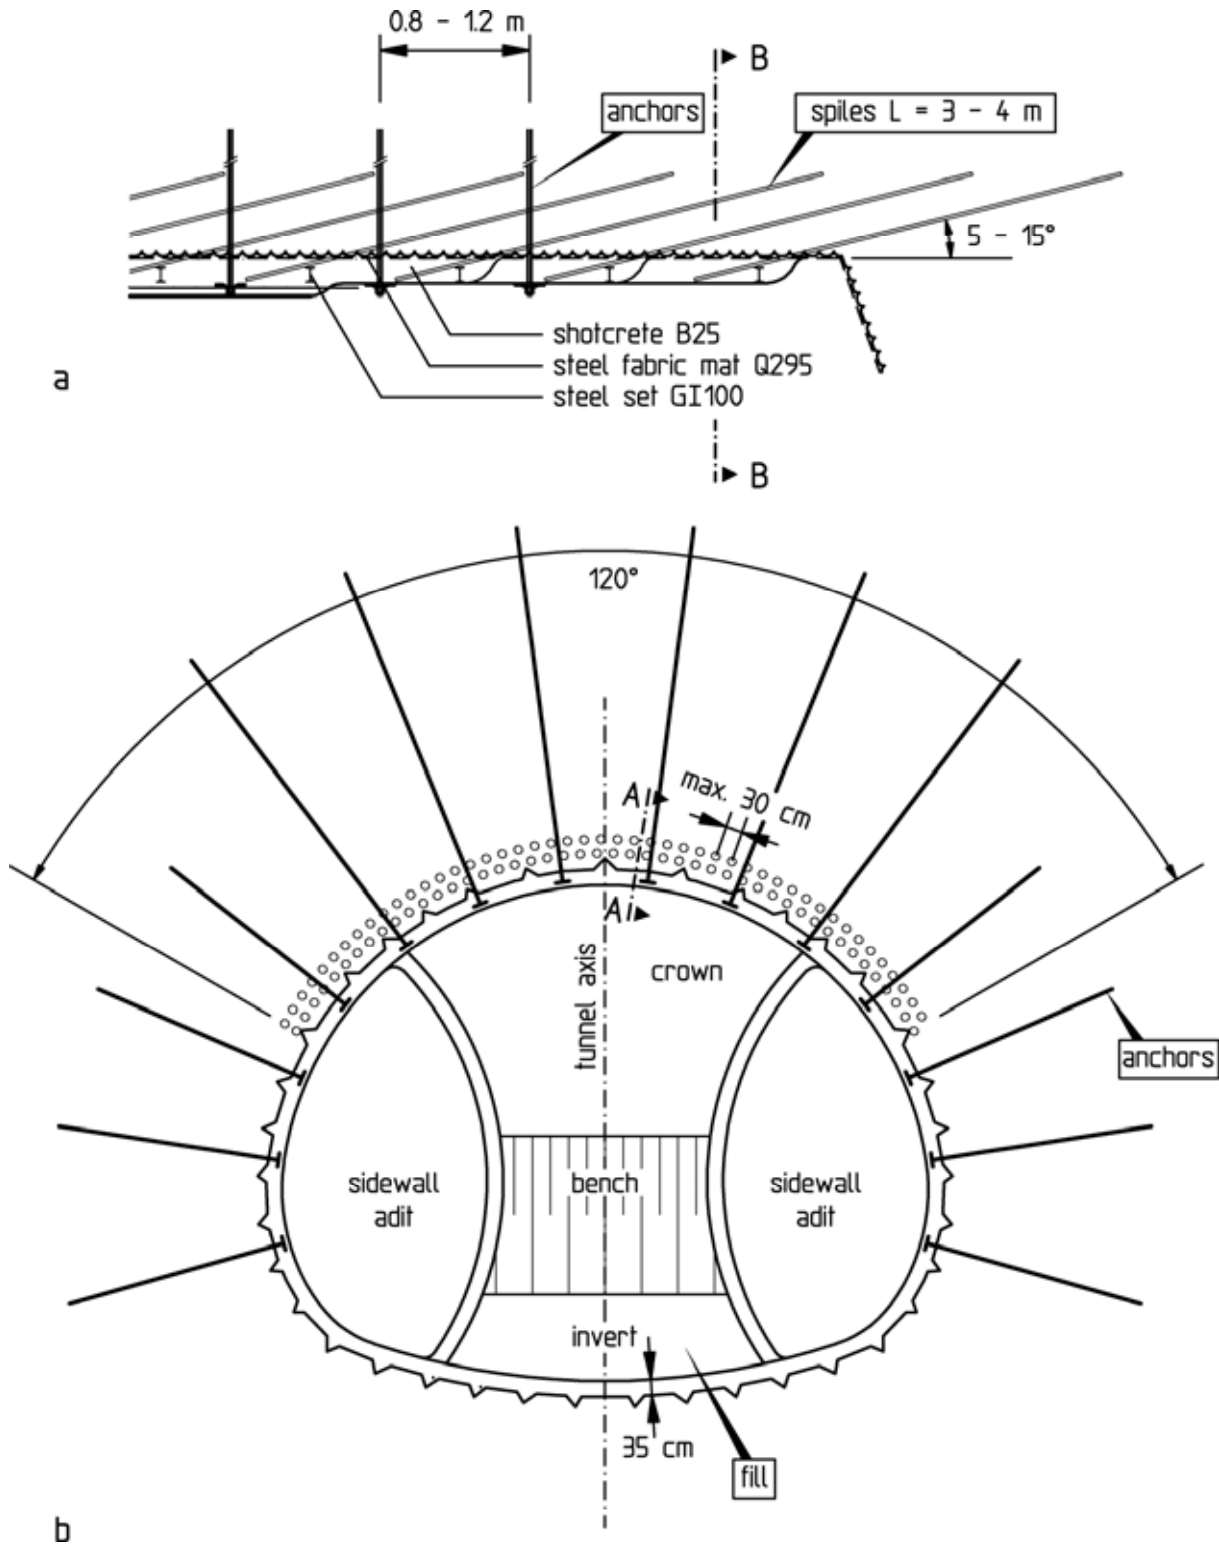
Advance support using spiles (spile umbrella Limburg Tunnel, new railway line Cologne - Rhine/Main): a) Longitudinal section A-A; b) cross-section B-B
